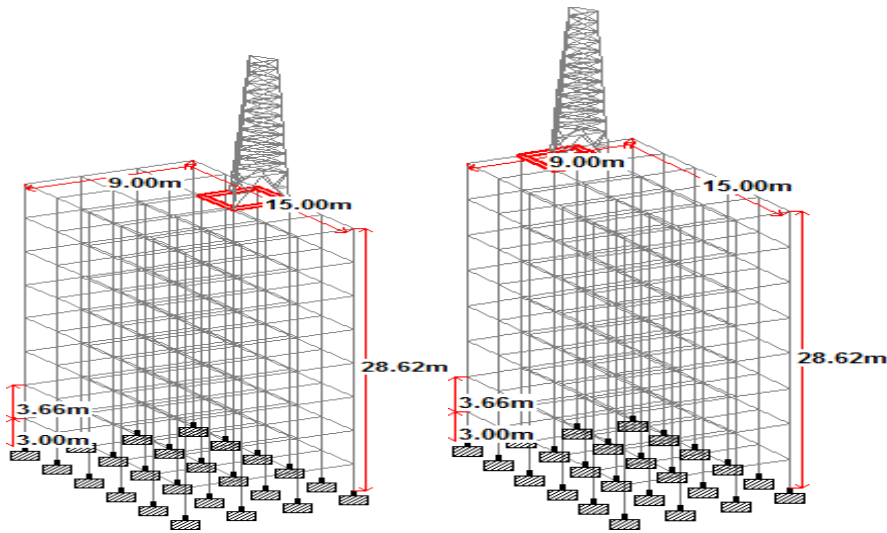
3D Elevation Model-3 Figure: 4 3D Elevation Model-4
